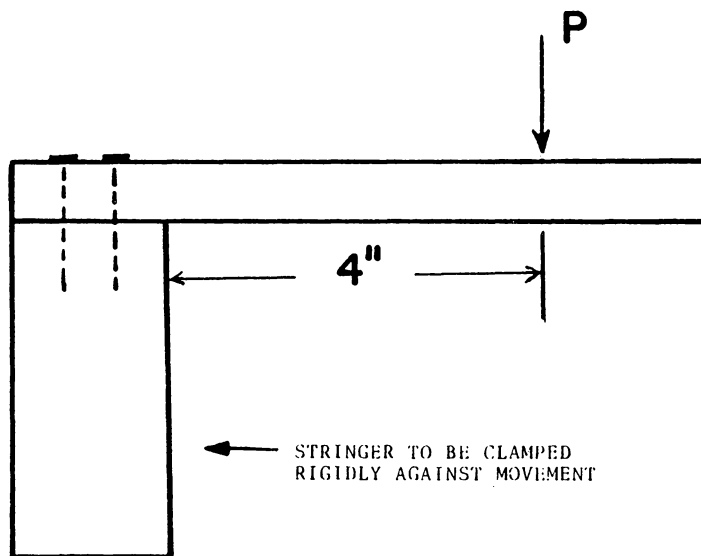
Loading Arrangement for Joint Rotation Specimen
